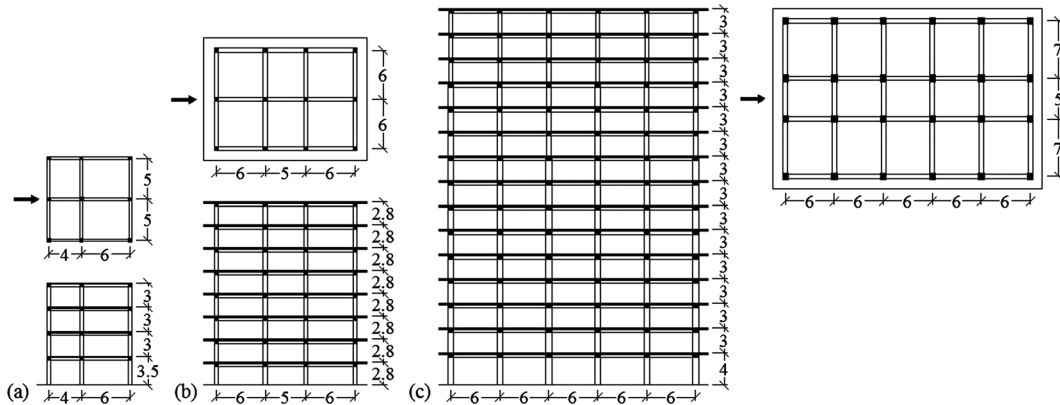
Elevation and plan views of (a) the 4-storey, (b) the 8-storey and (c) the 15-storey building, with the indicated direction of seismic loading.
